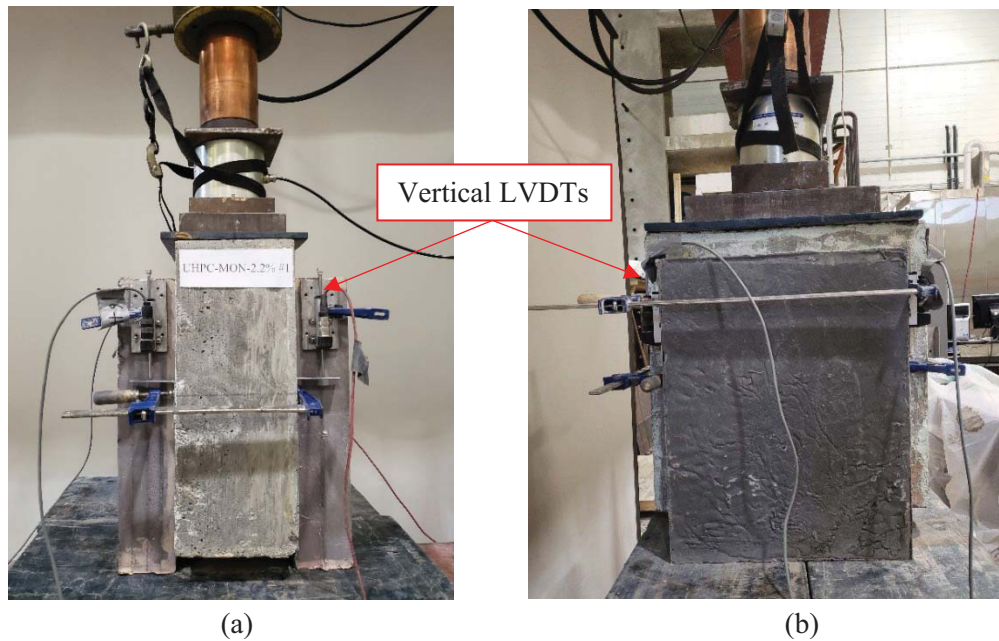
Double Shear Specimen Test Setup; (a) Front View, and (b) Side View.
